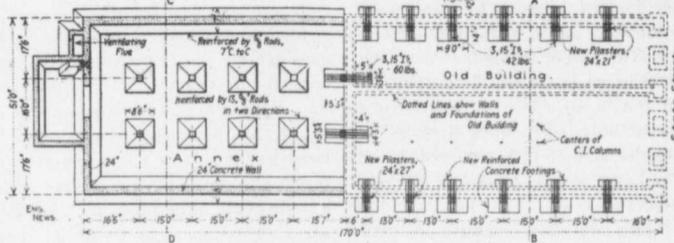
FOUNDATION PLANS OF COMBINATION BRICK AND CONCRETE BUILDING AT SALT LAKE CITY.
